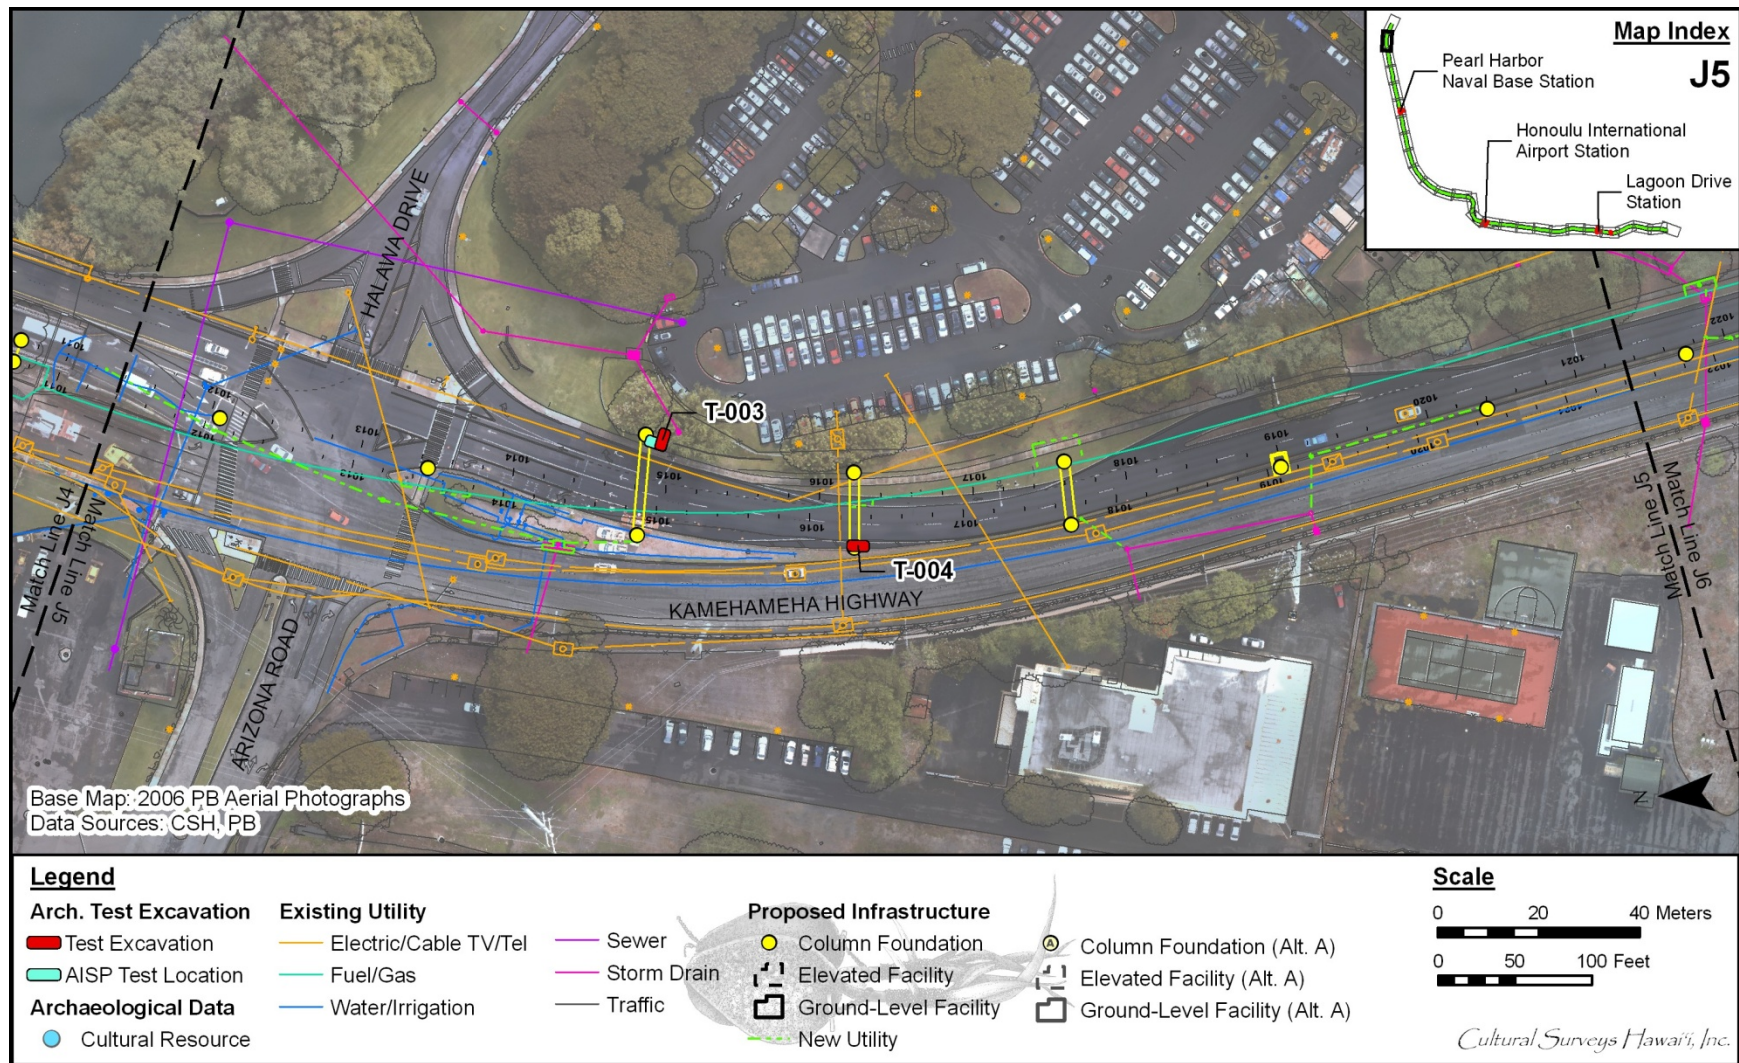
Map Sheet J5, two test excavations (T-003, T-004) at column foundations @ 1003+60 & 1004+90
